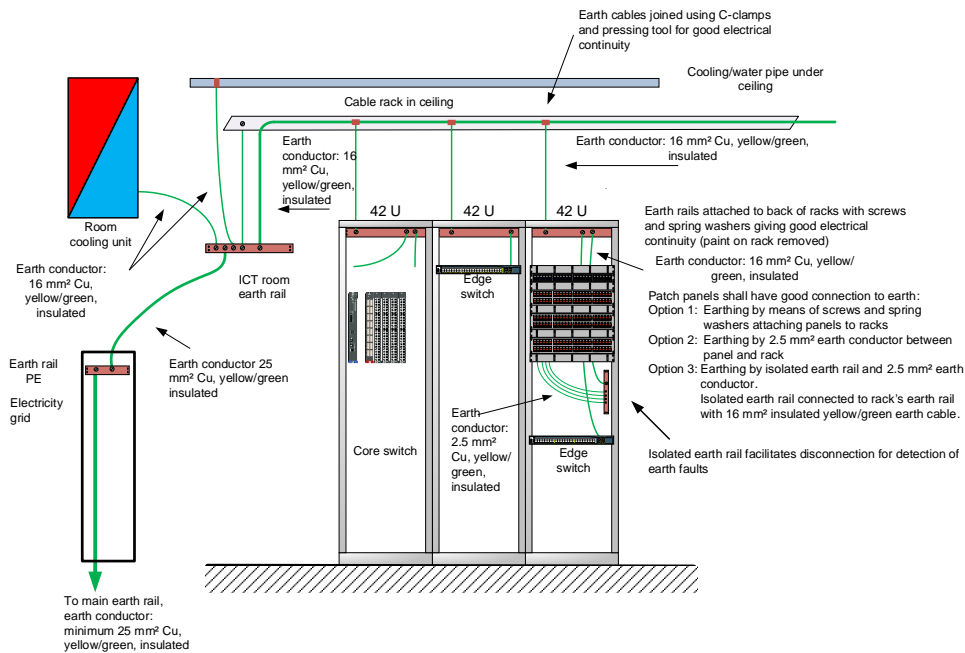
Principles of earthing of smaller ICT rooms without raised floors (server rooms, ERs, TRs, etc.)
